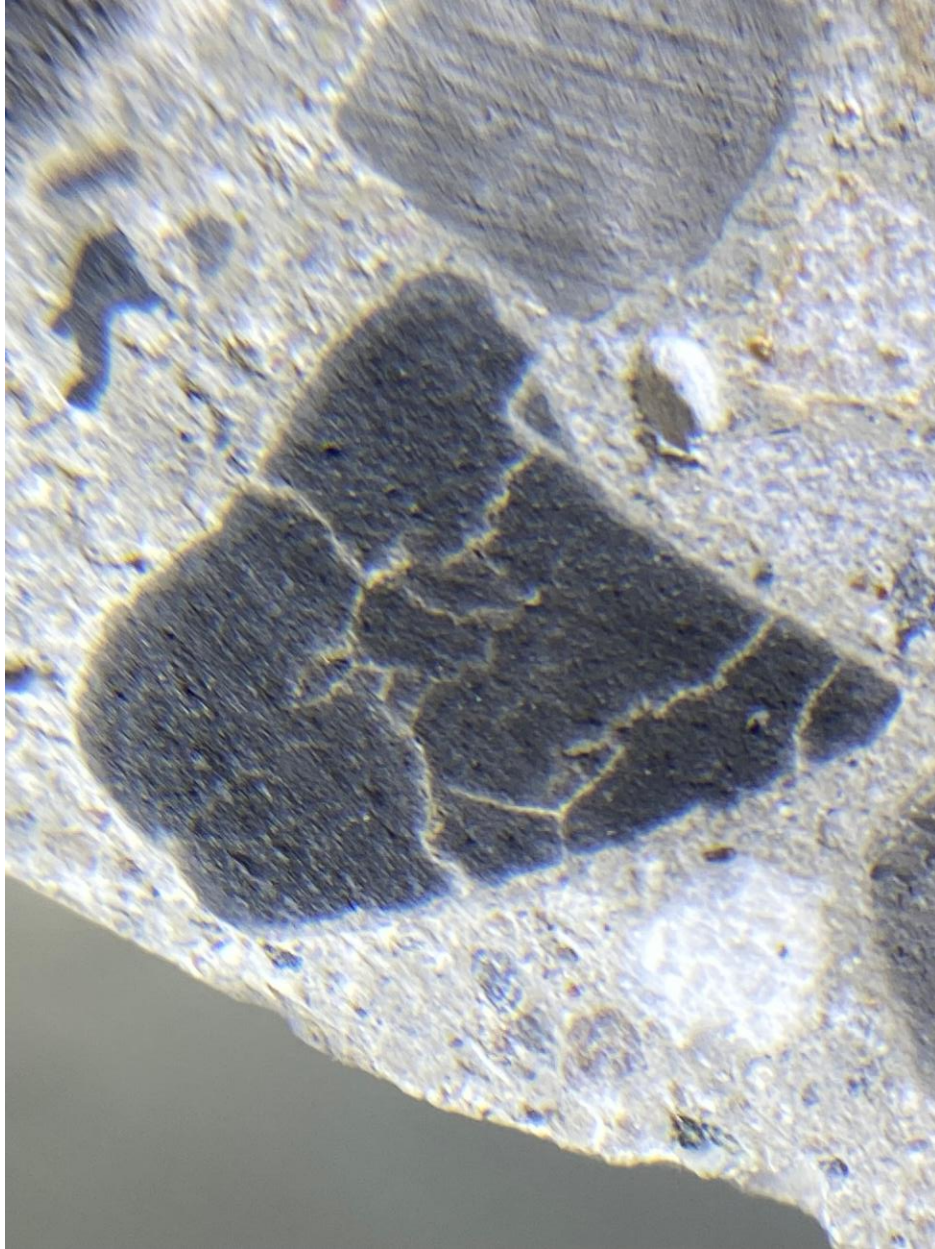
Aggregate in core 5 of lightweight concrete deck at bridge F-792 (1).
